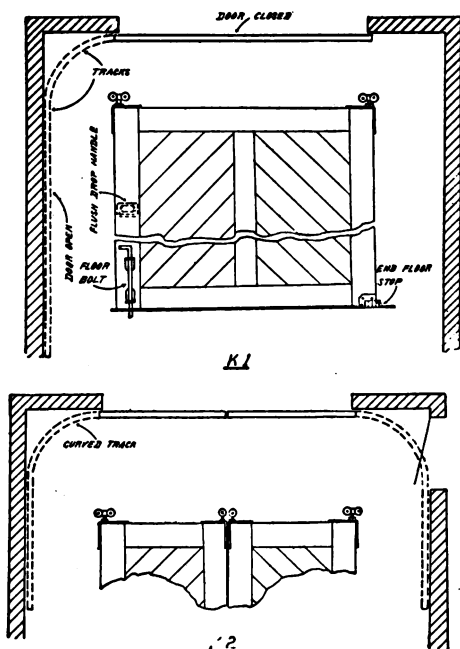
and Fig. 16a—Plan Views of Garage Doors Sliding on Curved Track with Various Other Details
